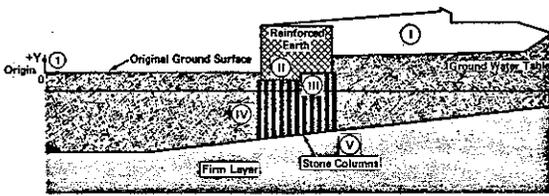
Proposed Stone Column Solution - Sioux City, Iowa
